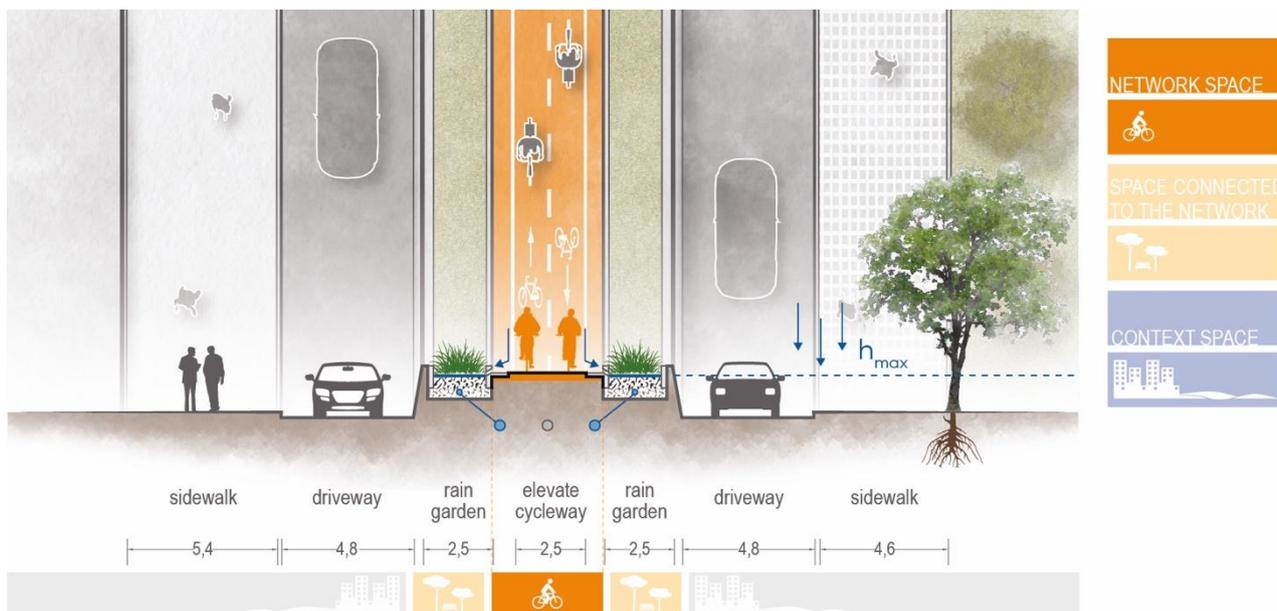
San Rafael, section and planimetry of Canal Street. *Original drawing by arch. Angelica Nanni.
